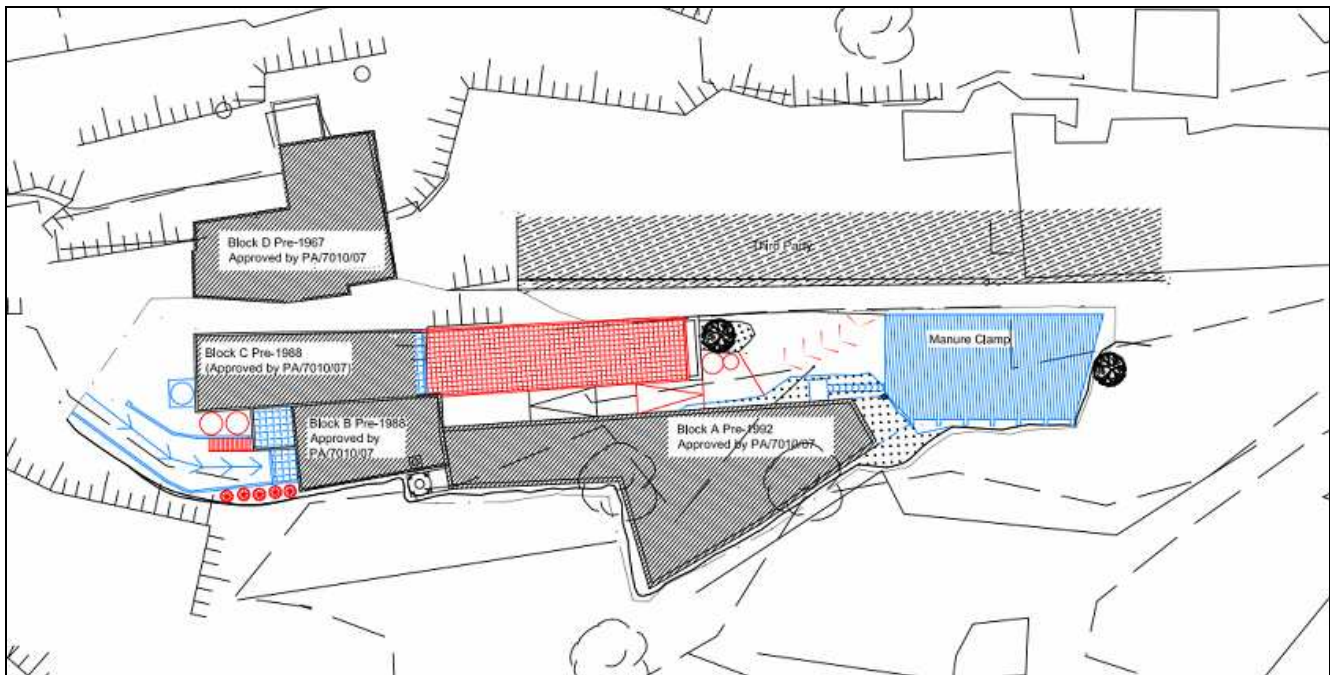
Proposed Block Plan (red indicates to construct while blue to sanction).
